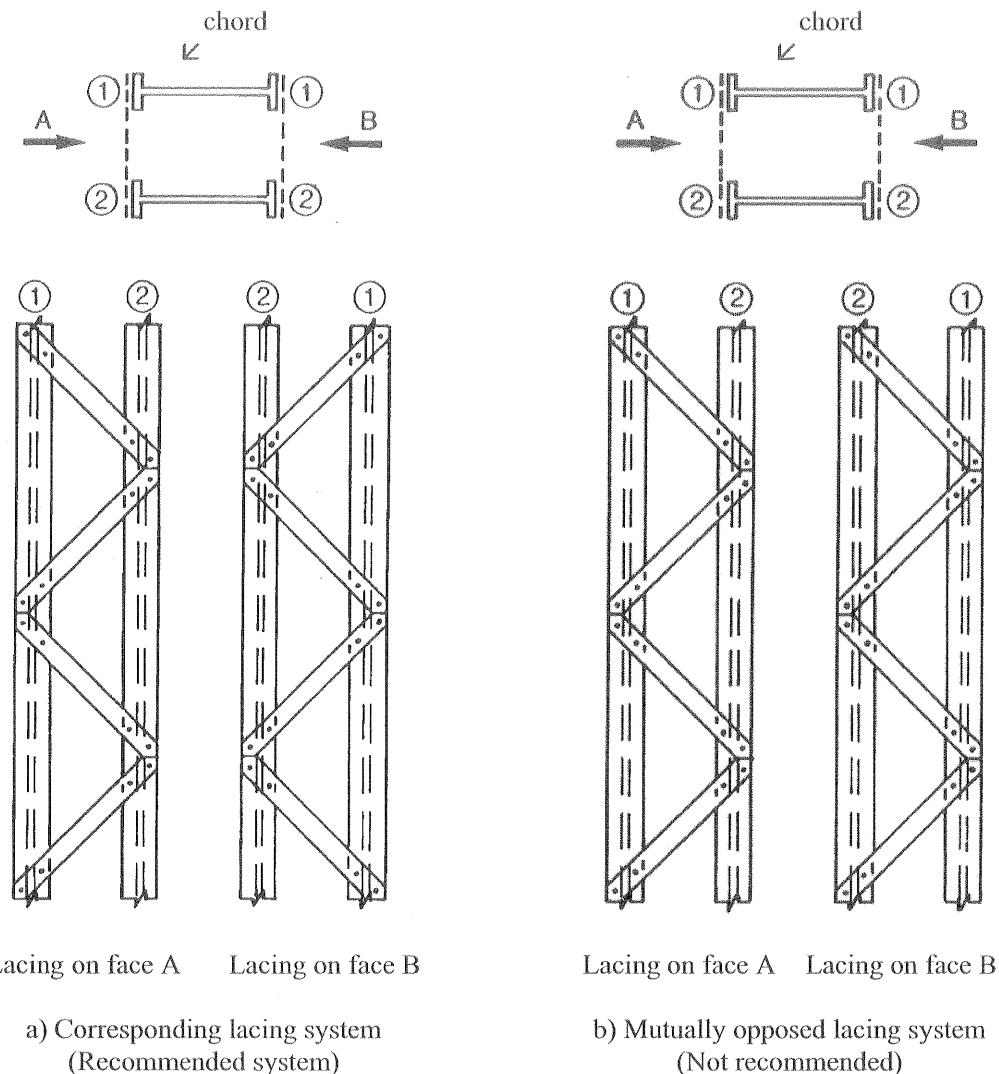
Single lacing system on opposite faces of a built-up member with two parallel laced planes
